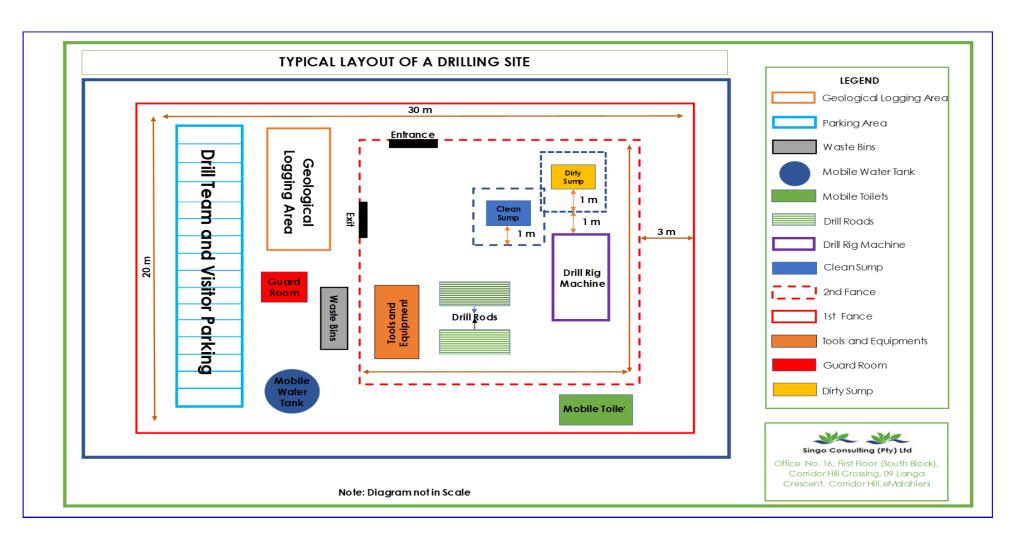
The drill site layout plan showing areas where specific activities will take place in the project area.
